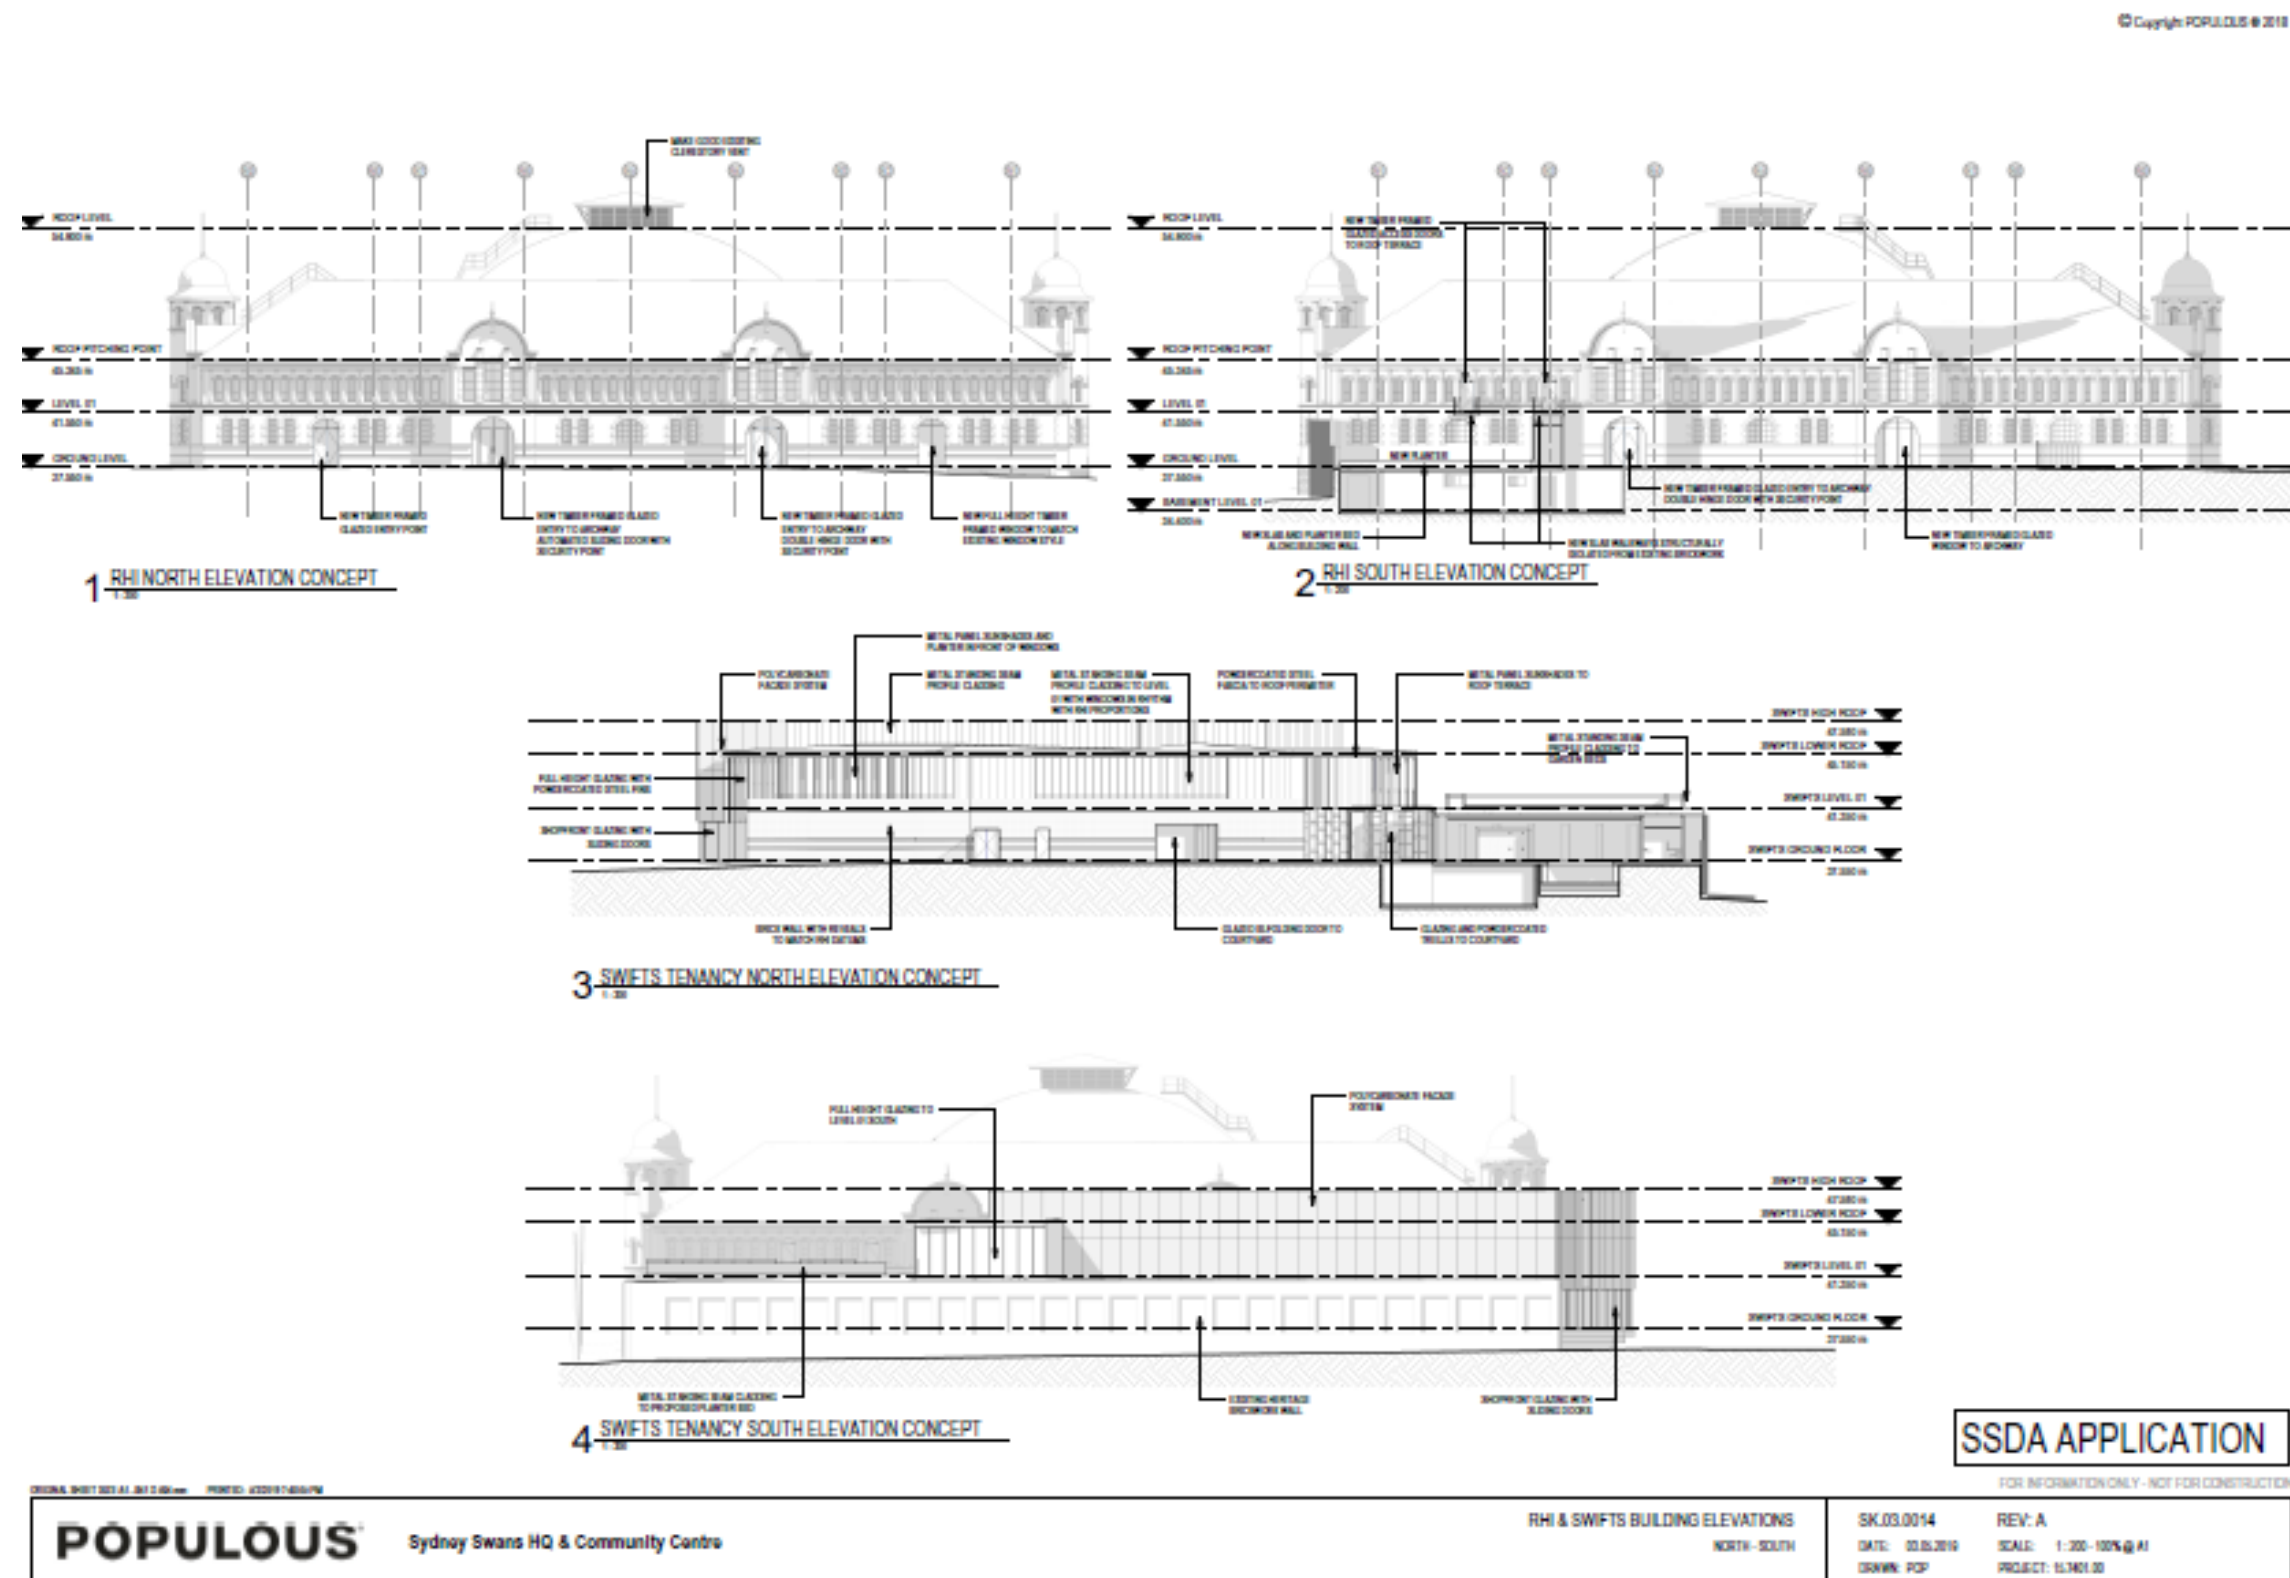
RHI & Swifts Building Elevations – North - South.
